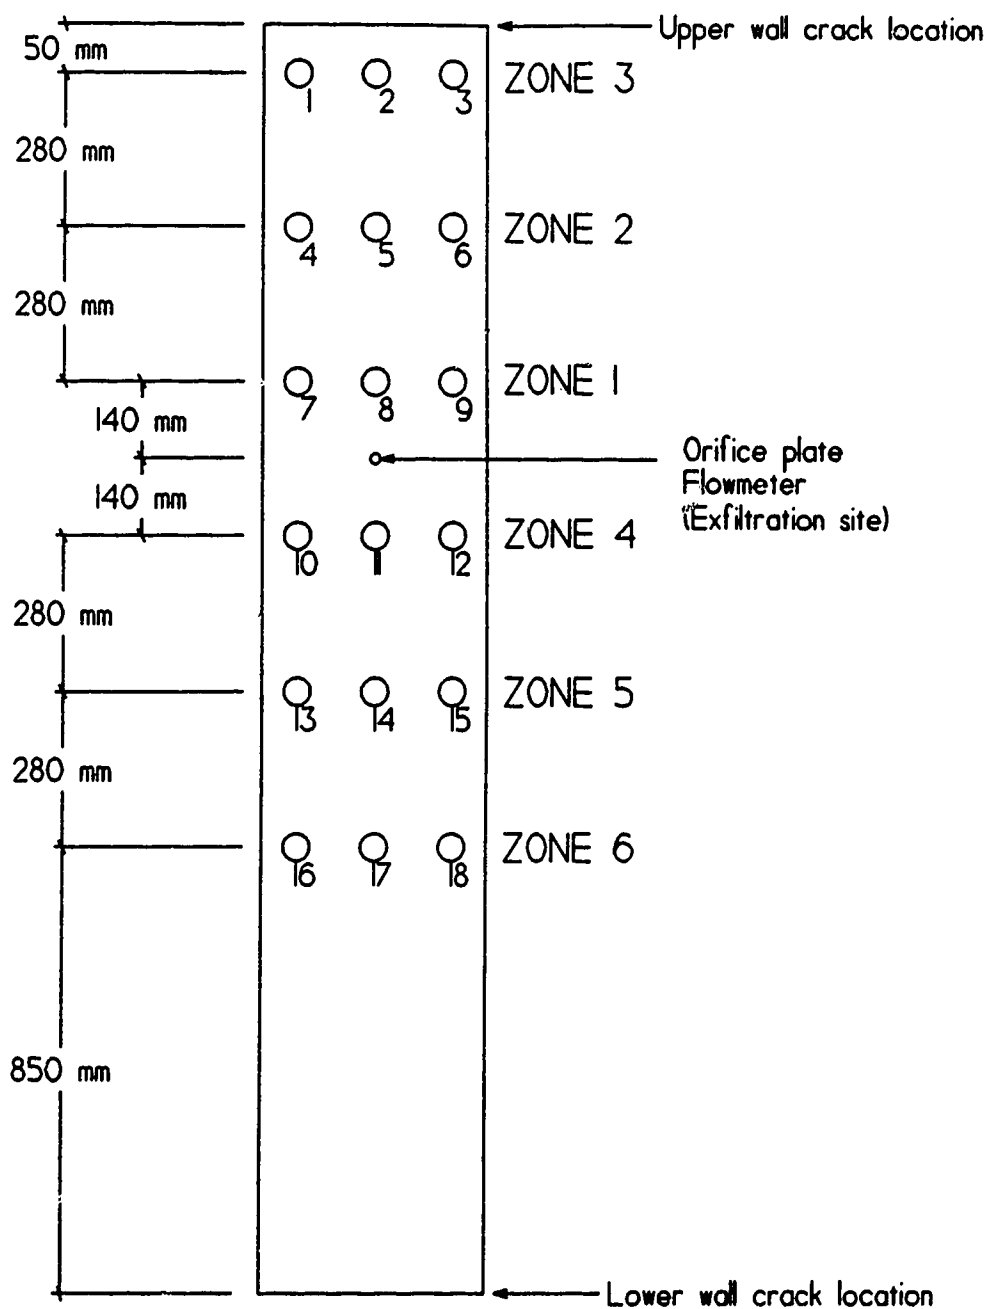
Labelling of the individual moisture plugs and grouping of the plugs into zones. Each zone consists of three horizontal plugs. Zones 1 to 3 constitute the upper wall section while zones 4 to 6 constitute the lower wall section.
